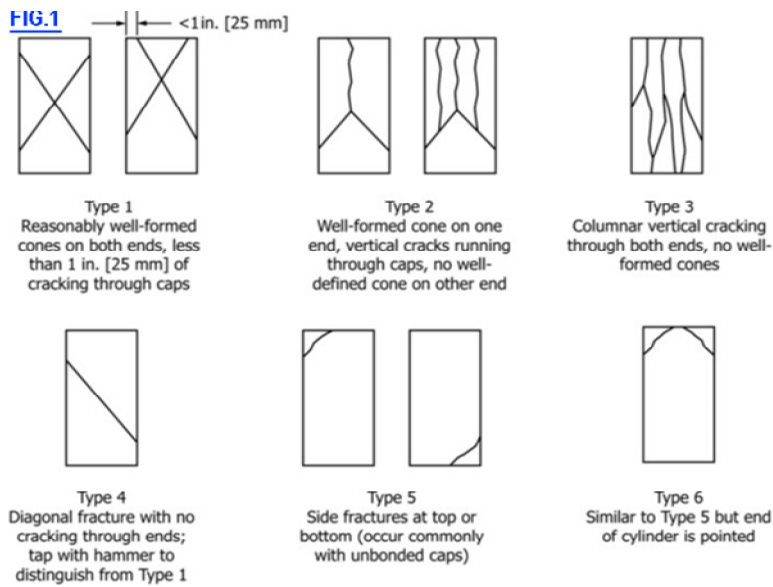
Shape of the concrete cylindrical specimen failure under monotonic compressive loading [147]
